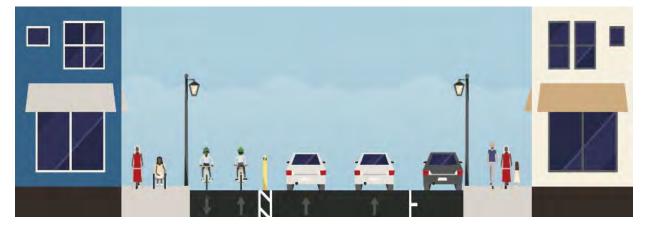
Proposed conditions on Wabasha Street between 4th Street and Exchange Street (looking north).
